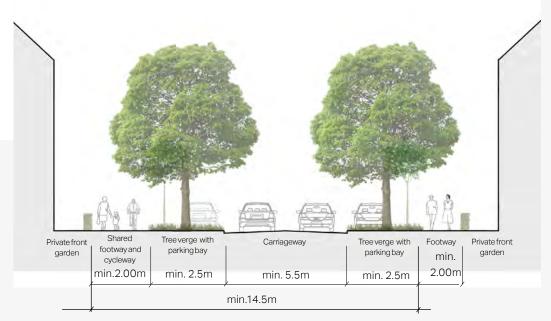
Cross-section to illustrate some dimensions for primary streets.
